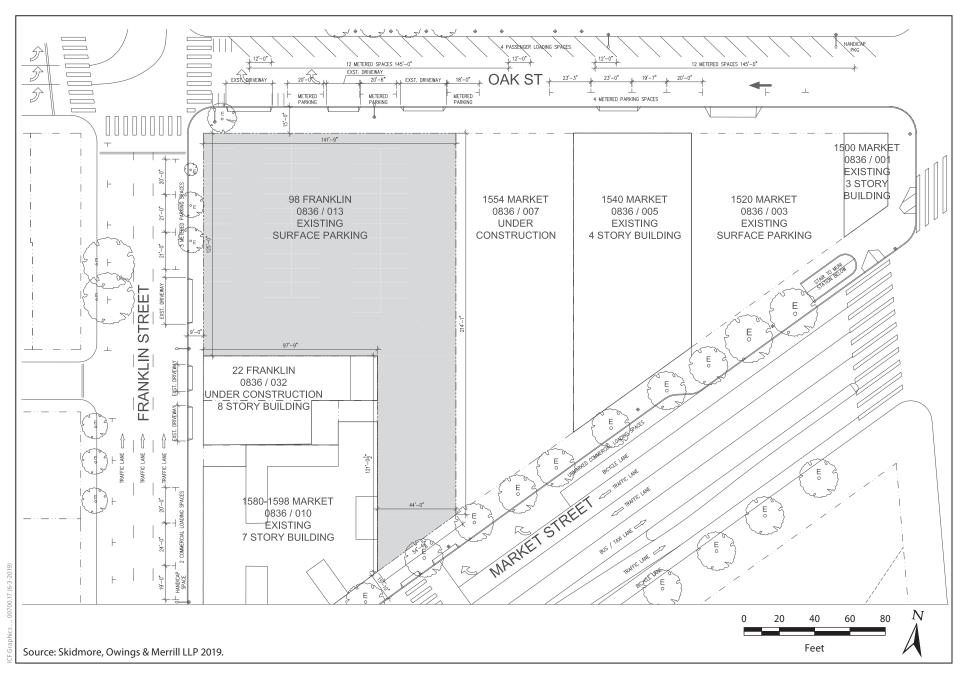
98 Franklin Street Project – Existing Site Plan
